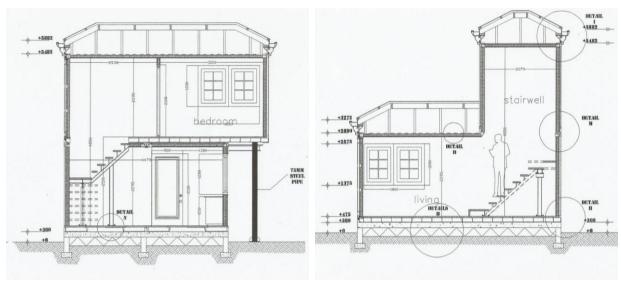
Sections X-X and Y-Y of proposed 2 bedroom house.
